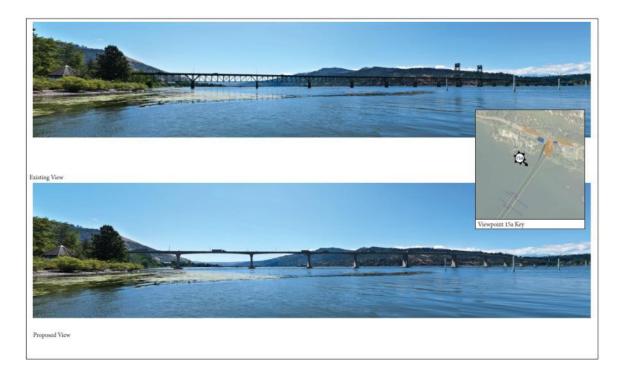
View of existing bridge (top) and simulation of proposed bridge (bottom), looking southeast
